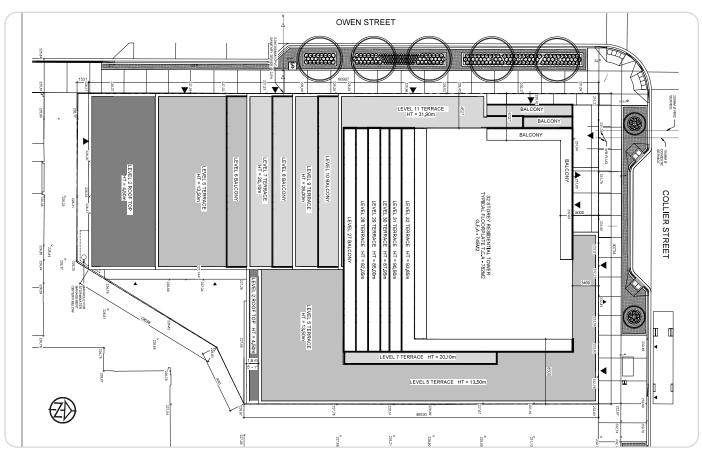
Site Plan, prepared by Scott Shields Architects Inc.
